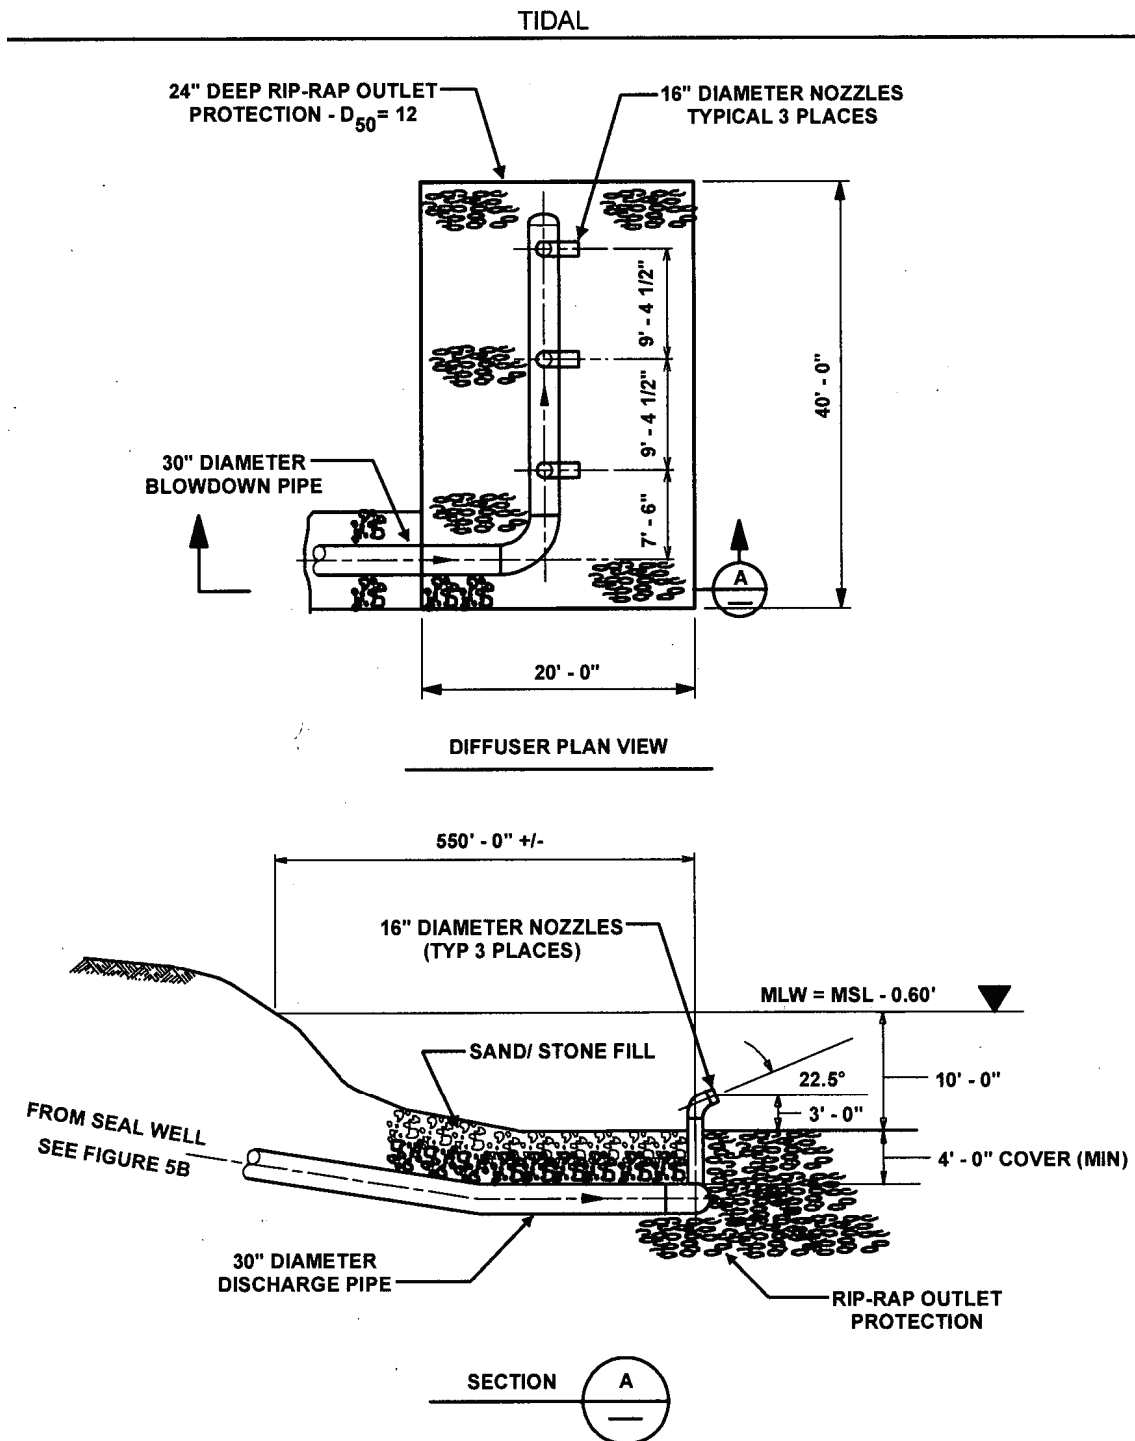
Discharge Outfall Details (UniStar 2008b)
